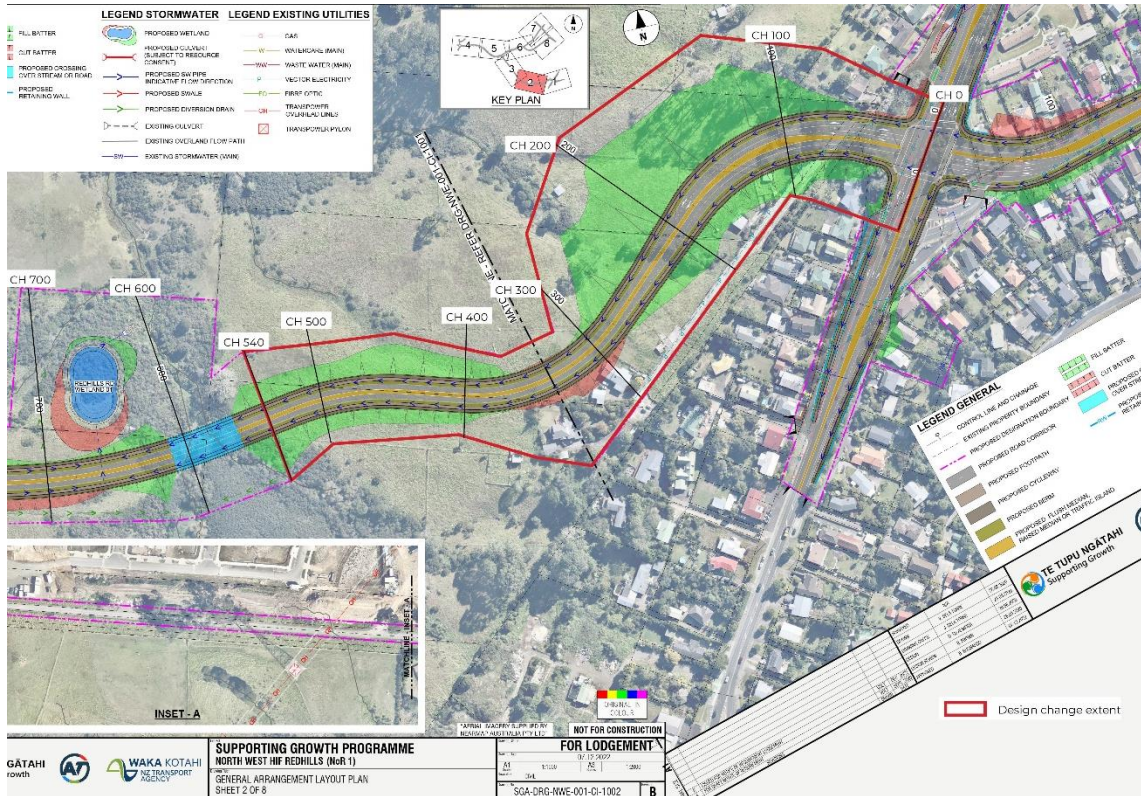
NoR 1 After Design Change (Proposed North-south Arterial Corridor Alignment) Between Chainage 0-540 (Don Buck Road/Royal Road intersection) to just before Proposed Stream Crossing
